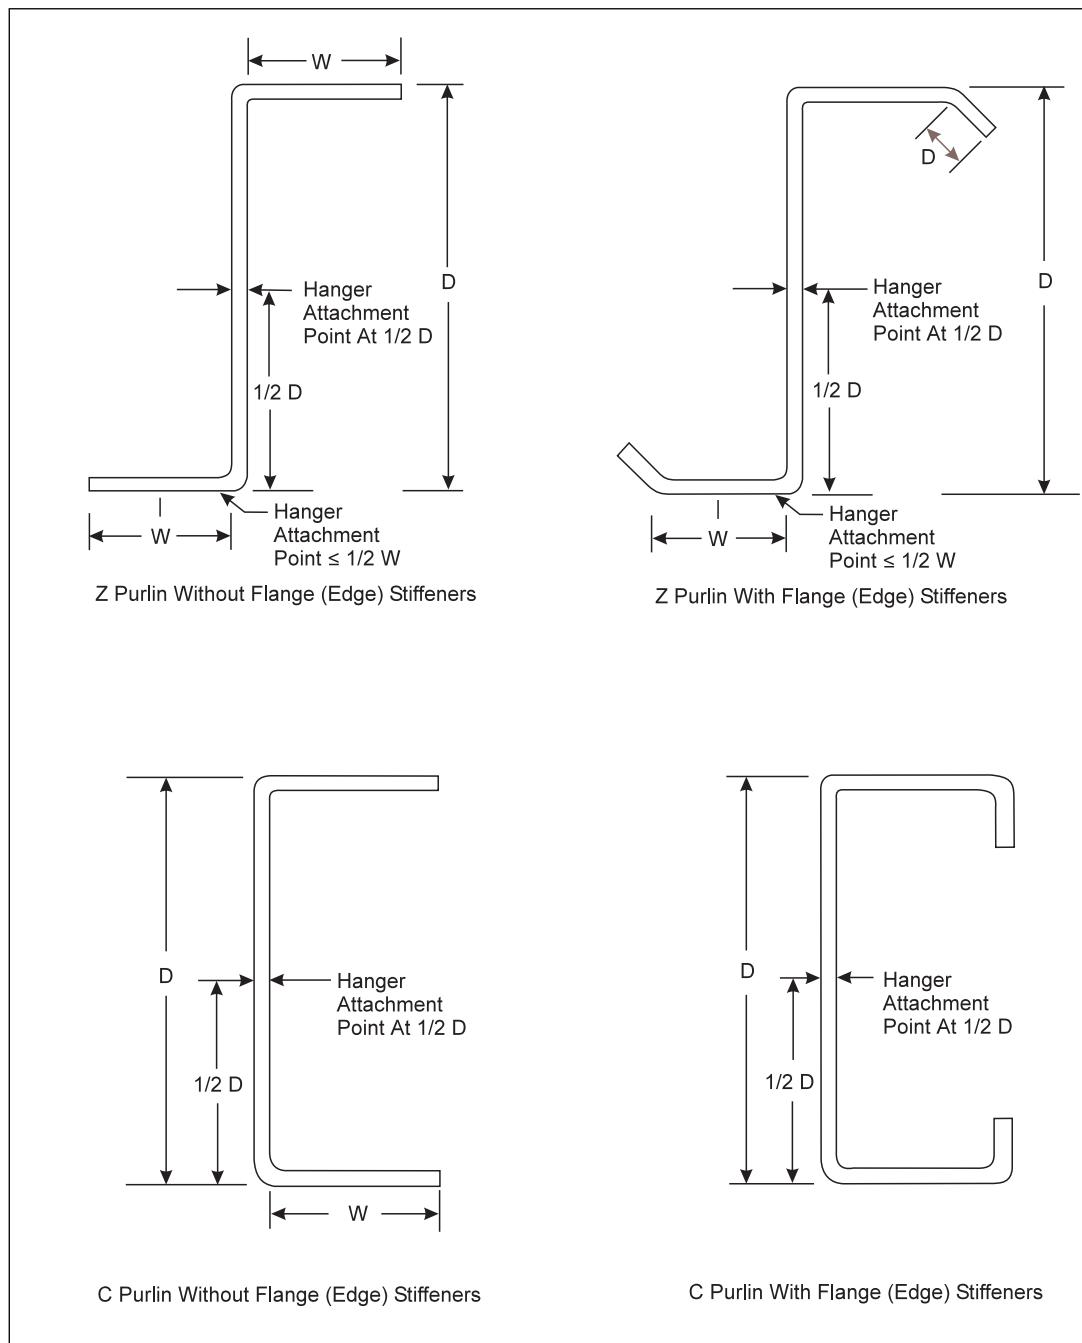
Attachment locations for hangers with C-shaped or Z-shaped purlins
